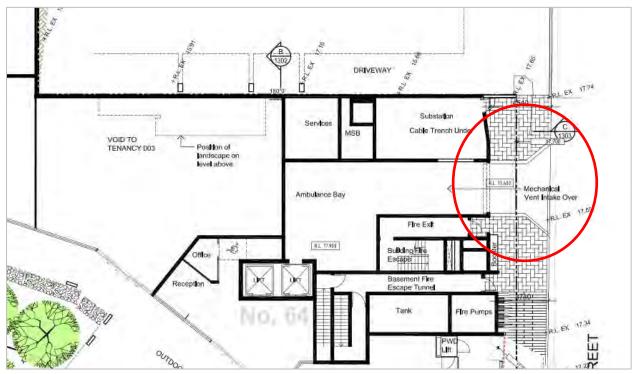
Proposed Site Access Driveway – Lockhart Street
